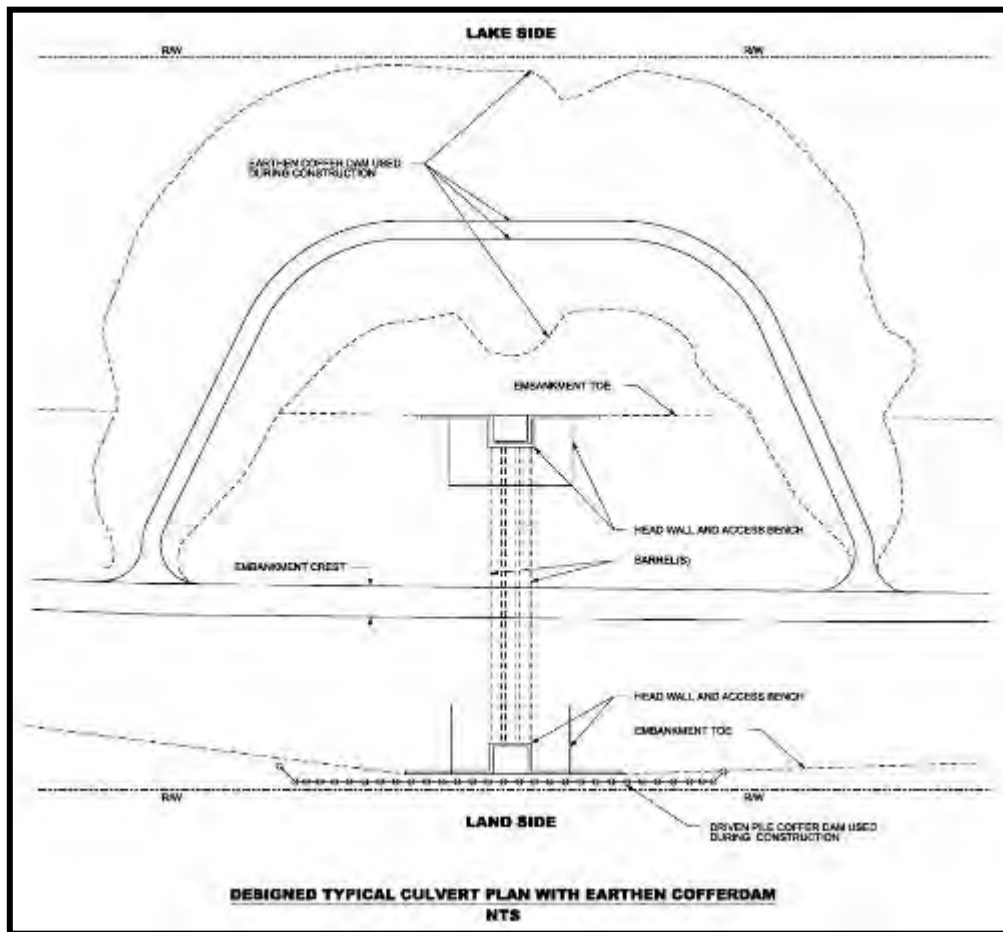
Typical Construction Footprint with Earthen Cofferdam – Plan View
